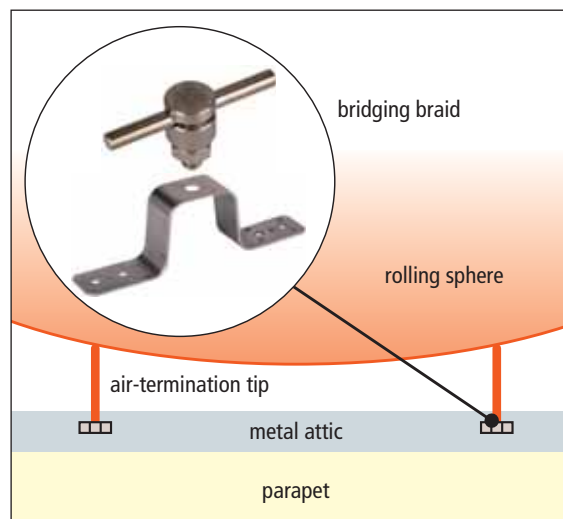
Example how to protect a metal roof attic, if melting through is unacceptable (front view)
